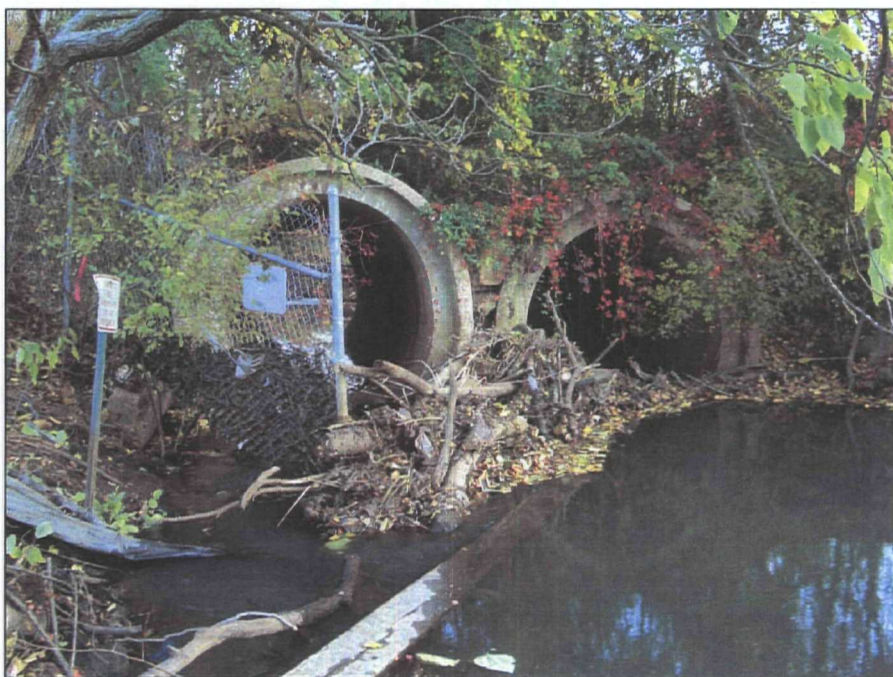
Area South of the twin culvert with geotextile and rip-rap installed (October 22, 2008).
